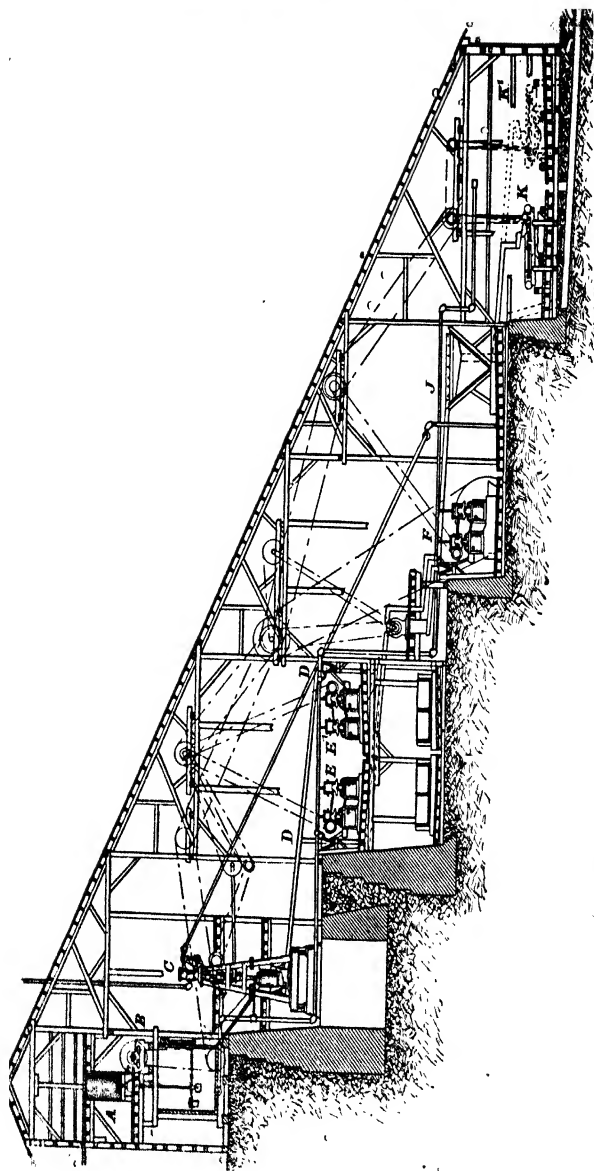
Steam stamp plant for native copper. Sectional elevation.
